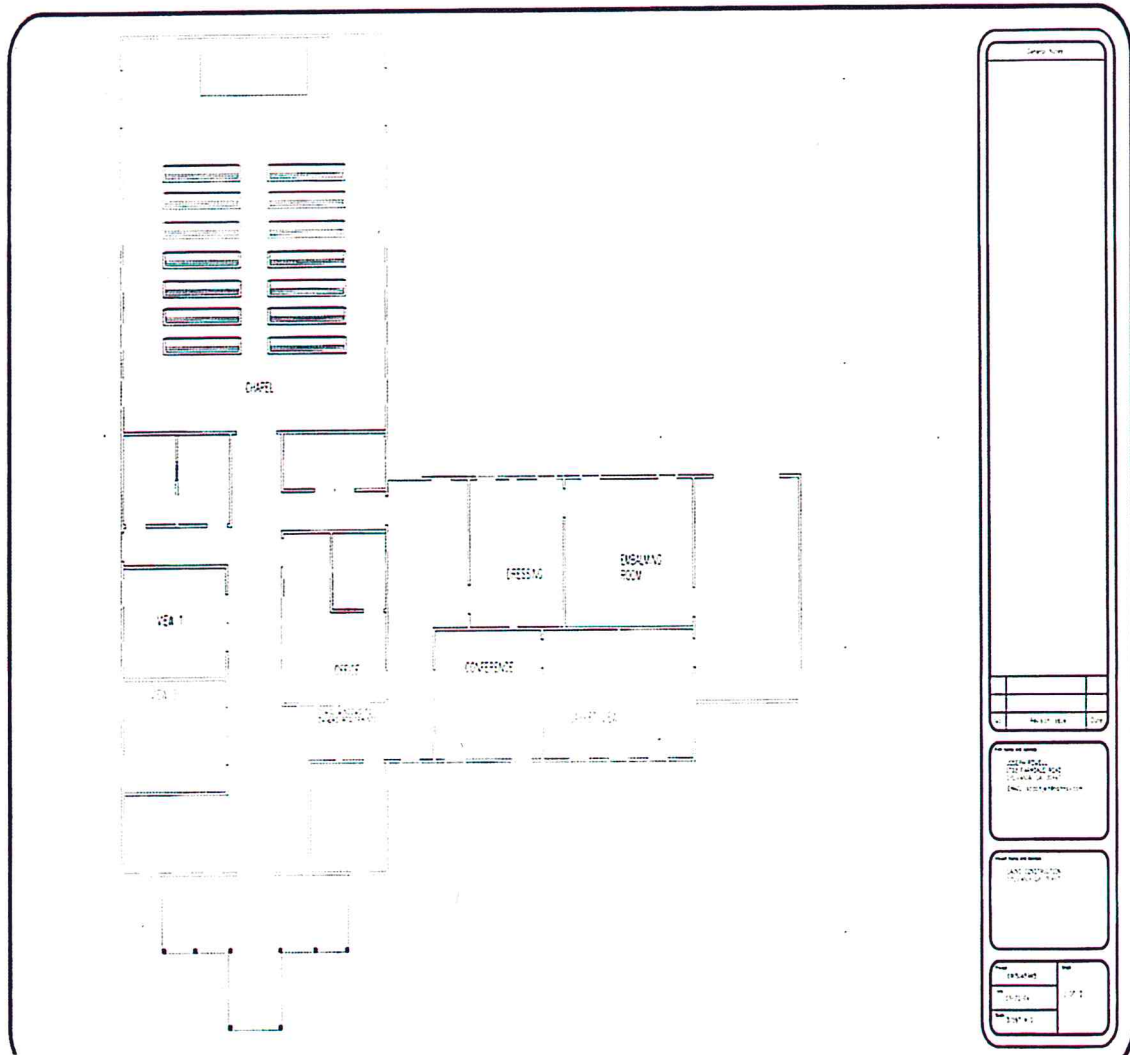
EXHIBIT B: PROPOSED CONCEPT PLAN CONT'D
